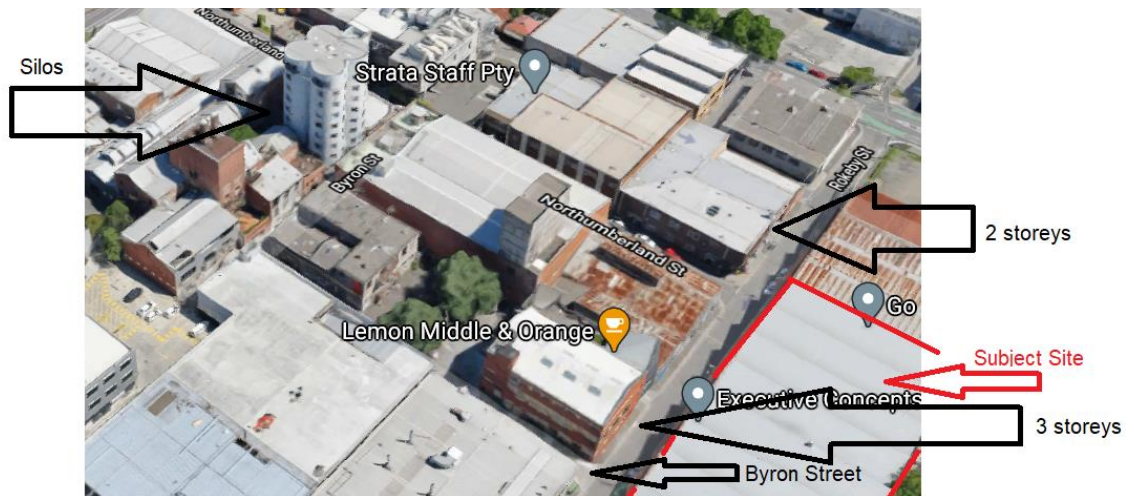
Aerial identifying western context of Rokeby Street and proximity and access to Silos.
